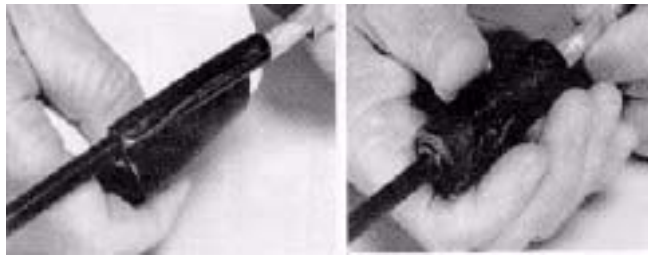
Schematic Diagram of Wrapping Waterproof Adhesive Tape Around the Grounding Cable
